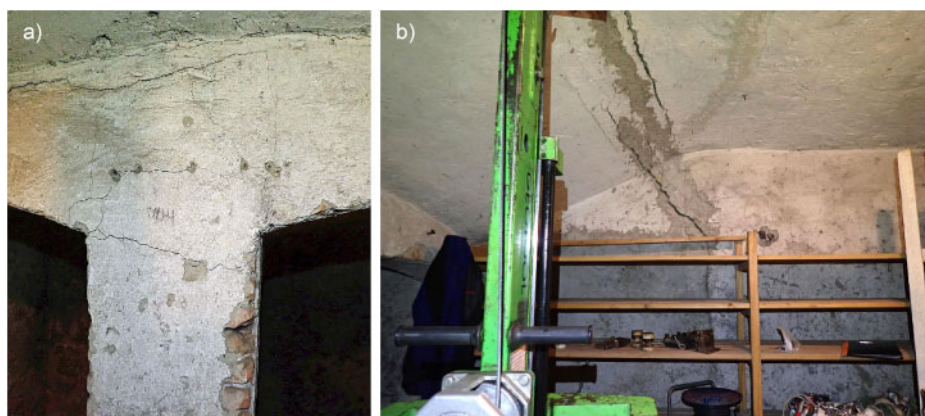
Examples of fissures in the masonry walls and pillar of the building structure in the basement.
